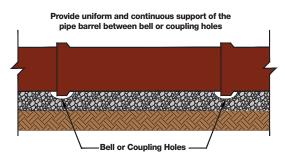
Clay bell or couplings should support no part of the trench backfill load
